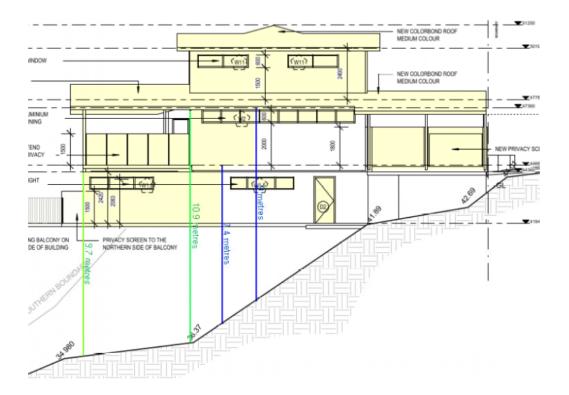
Proposed wall height shown in green, existing wall height shown in blue.
